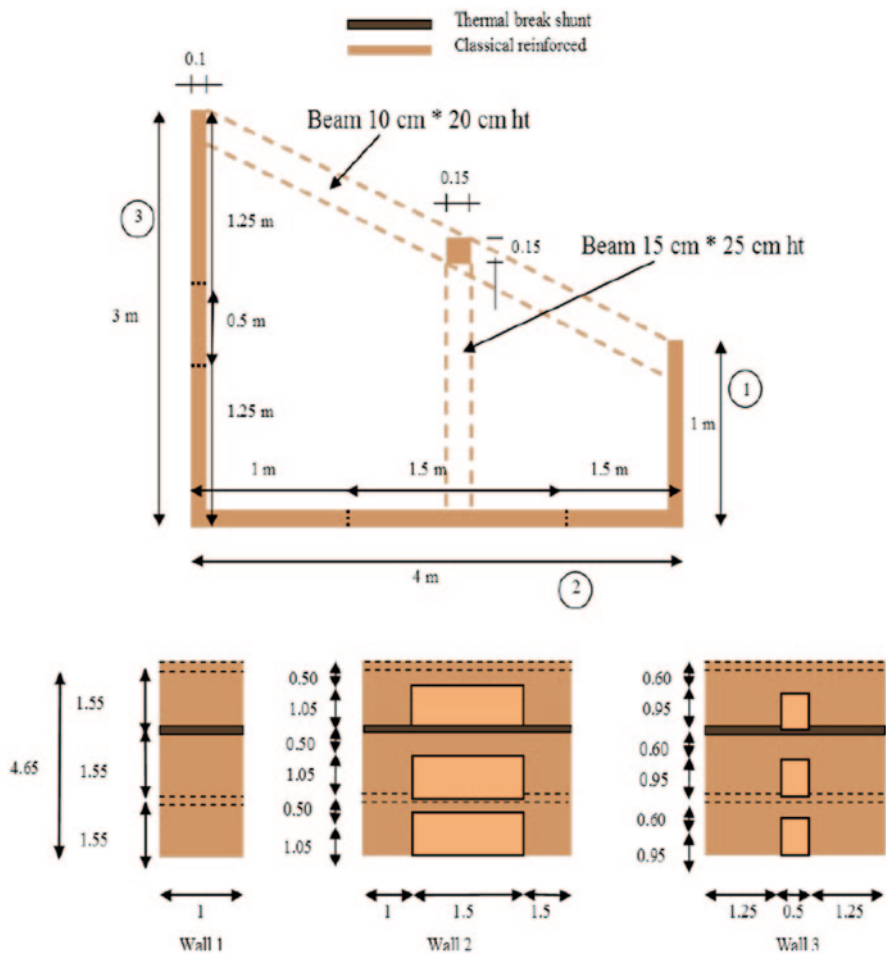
Plan and elevation of ENISTAT specimen (wall dimensions are in meters and the *solid part* in the floor represents slabs with thermal break elements)
